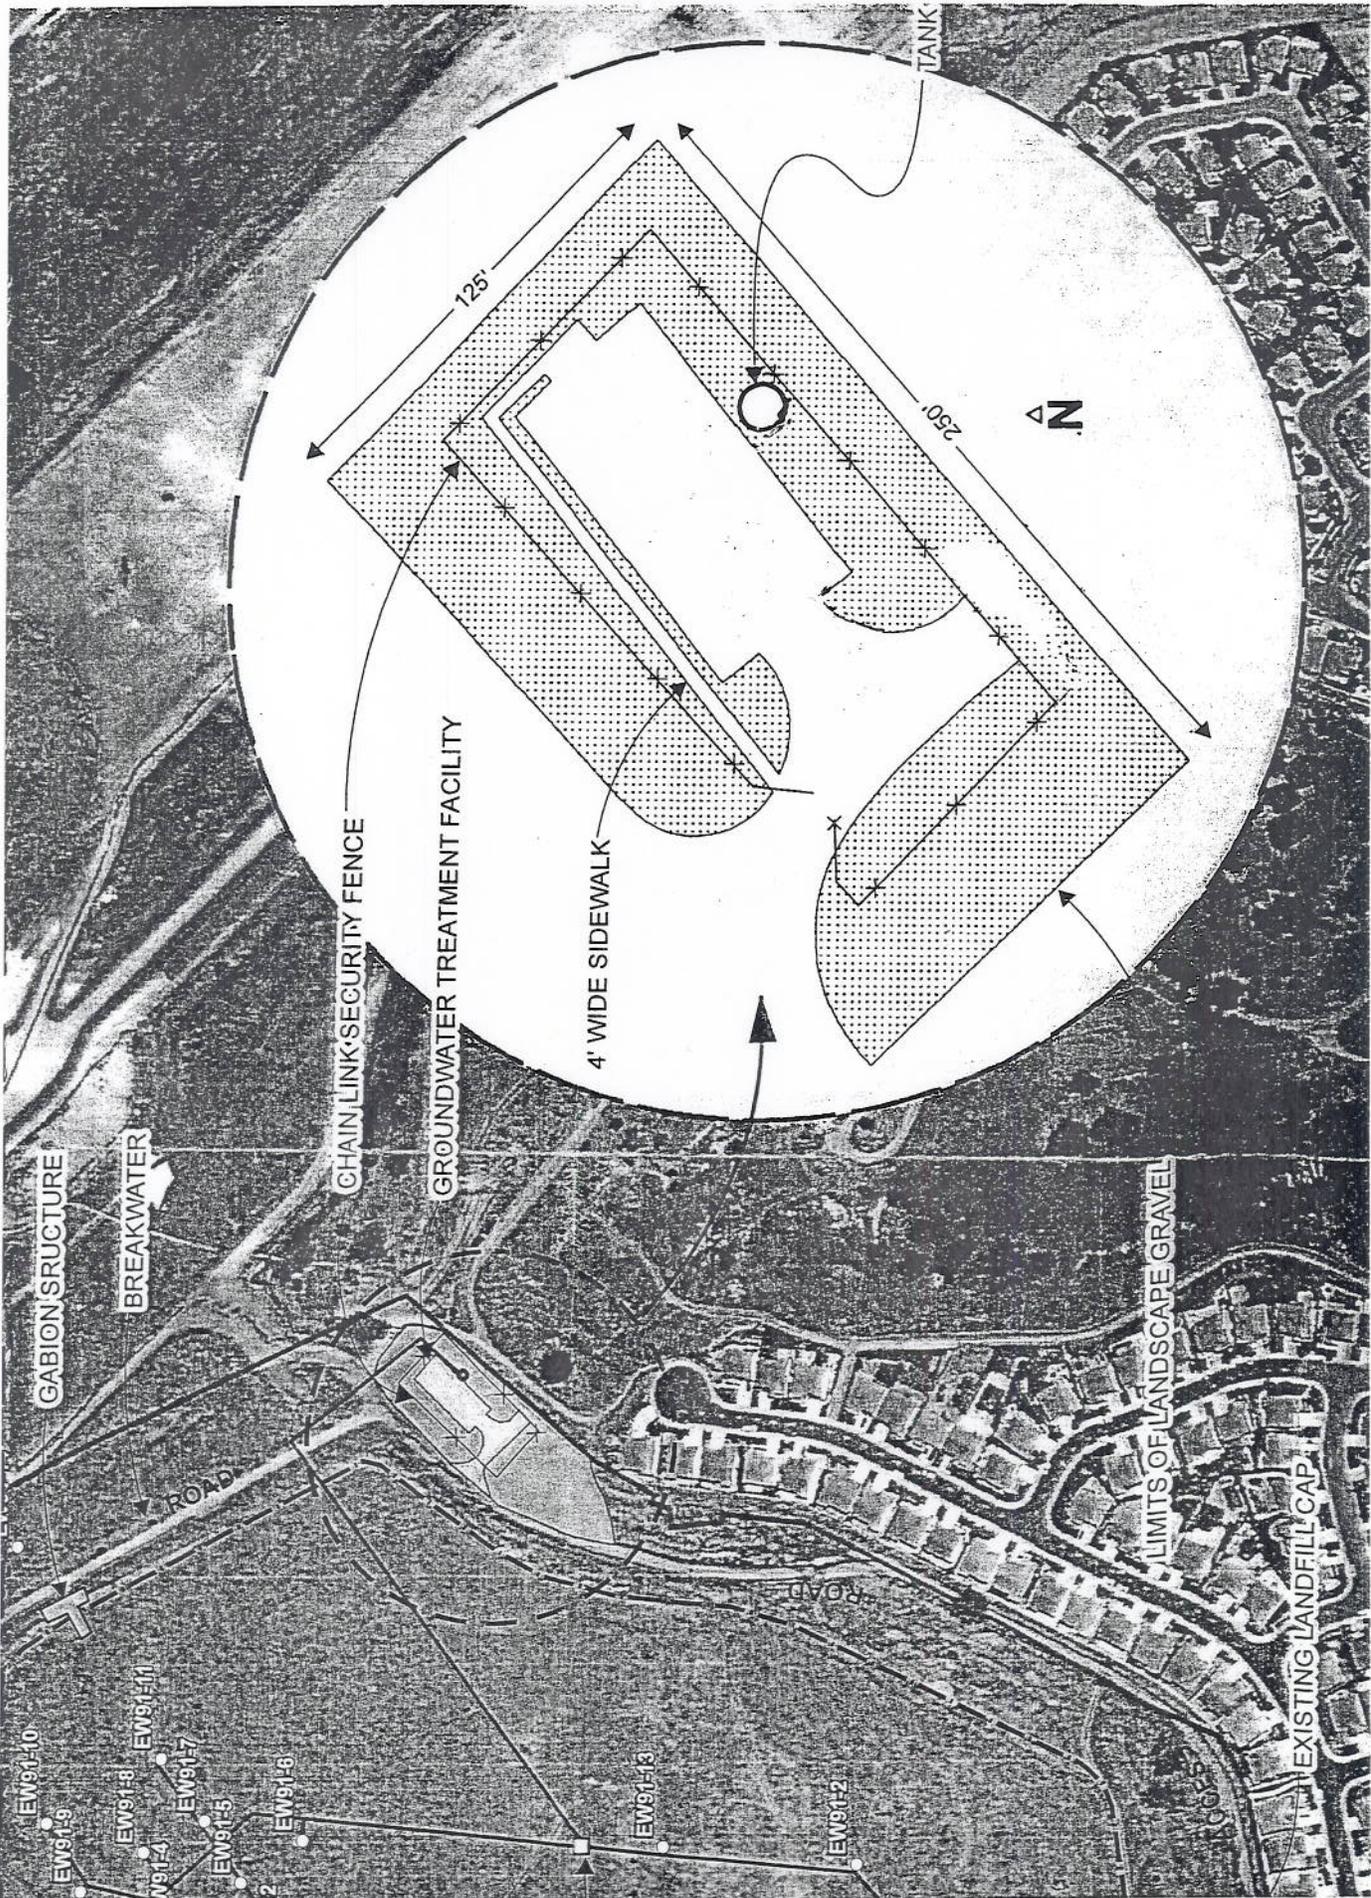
Location and layout of the decommissioned groundwater treatment facility at Hamilton Army Airfield, Novato, CA. Building and grounds (inset) must be rotated 120° clockwise to align with Figures 5 and 6. Photo and layout courtesy of the US Army Corps of Engineers, February 2010.
